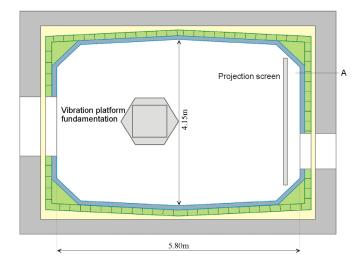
Ground plan of laboratory room with: A: wall structure from right to left: masonry (old), mineral fibre 10 cm, steel skeleton with 11.5 cm lime sandstone, mineral fibre 15 cm, perforated metal sheets
